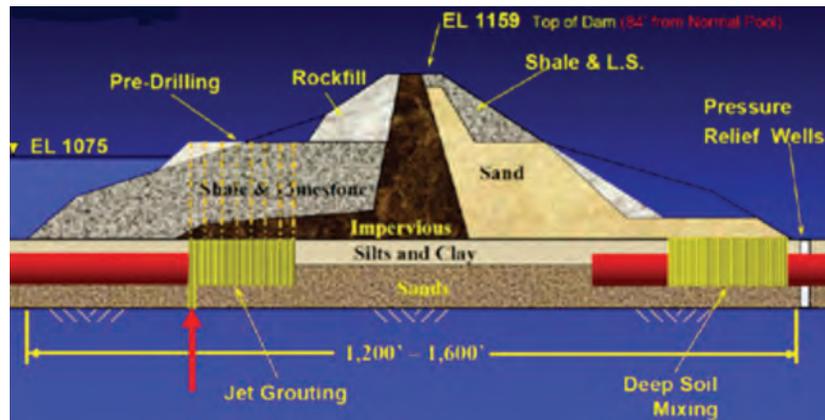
(above) Tuttle Creek Dam Project cross section, showing original remedial action to address deformation and drainage (EL = elevation, in feet).
